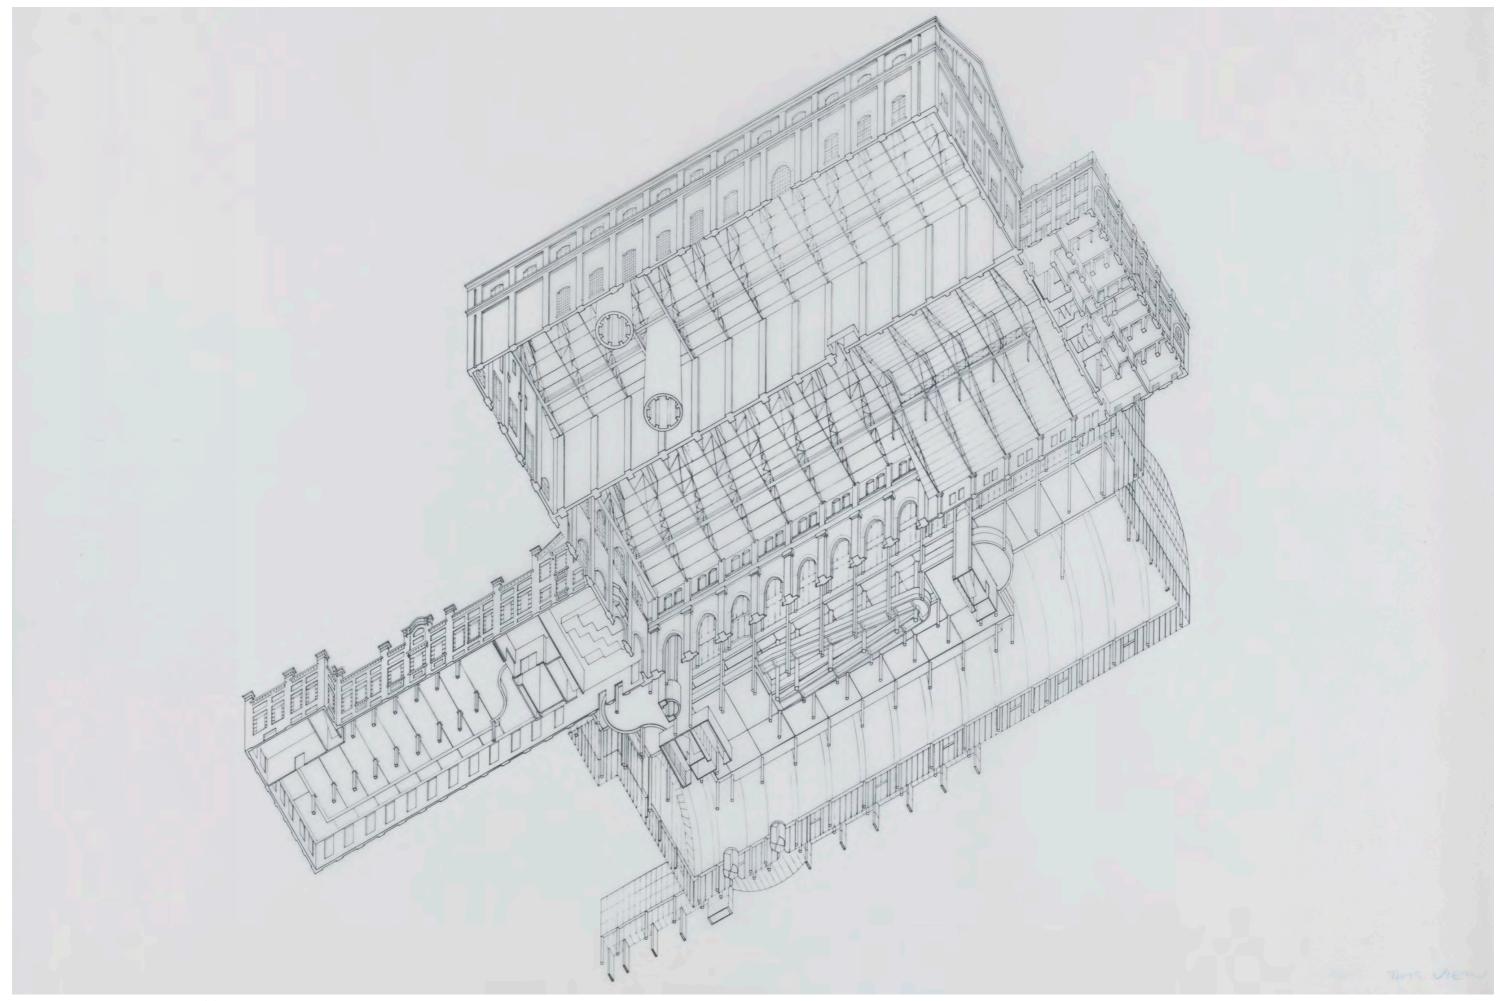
2008/88/1 Architectural drawings (14), Powerhouse Museum, tracing paper / microfilm / ink, designed by Lionel Glendenning, made and used by New South Wales Department of Public Works, Sydney, New South Wales, Australia, 1987
